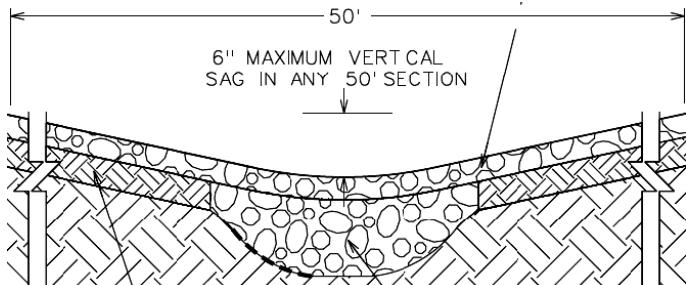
Typical Road Profile Crossing Existing Swale Area
